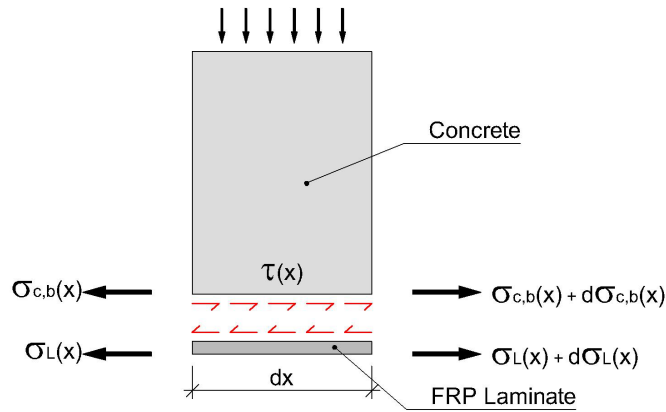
Forces acting on a differential section of a strengthened beam, dx .
